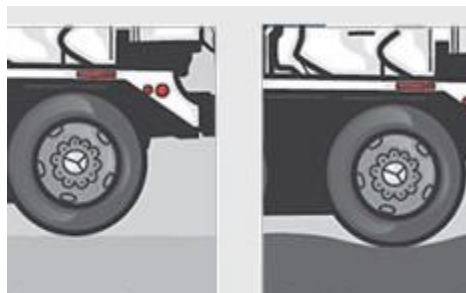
Response of flexible (right) and rigid pavement (left) to heavy load traffic (Pavements 2017).
